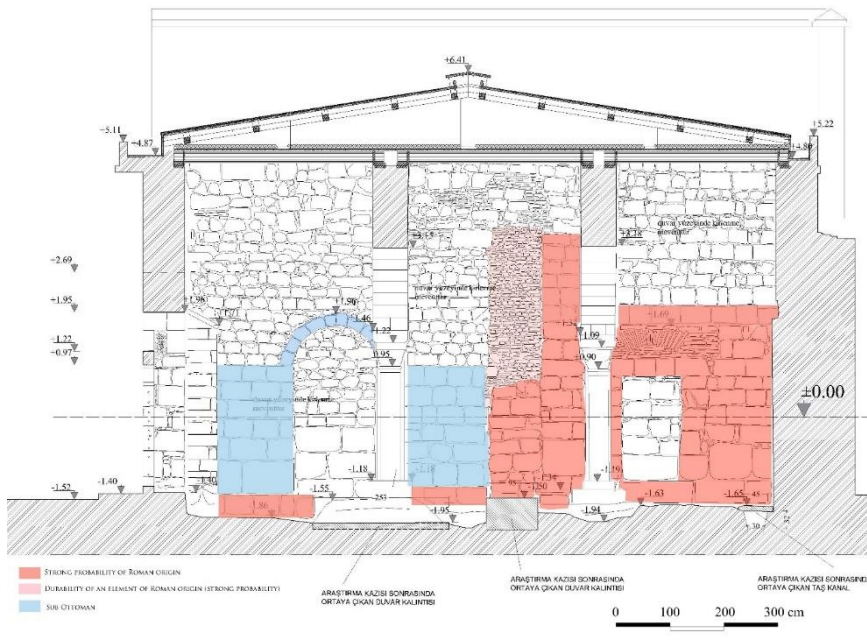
Views Of The Elevations On The Small Inner Dimensions Of The Building
